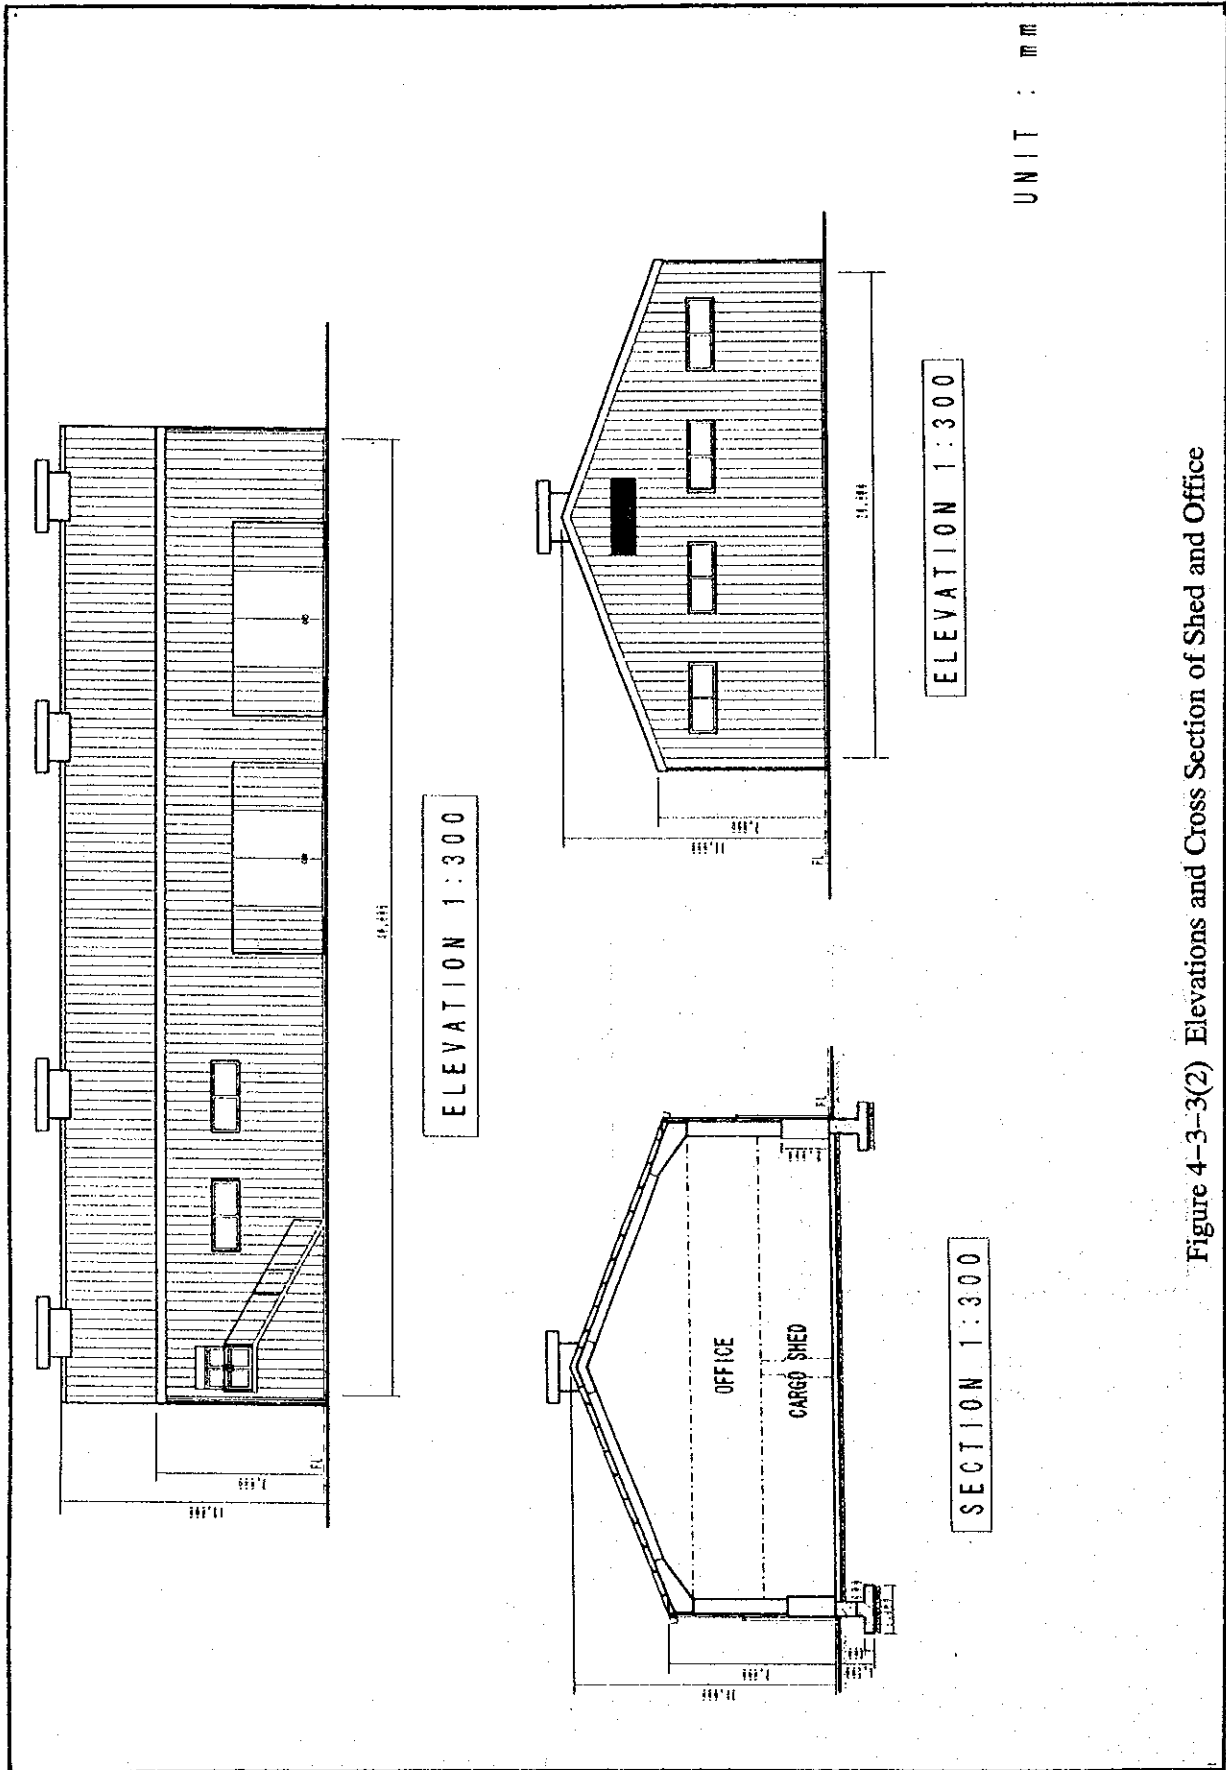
(2) Elevations and Cross Section of Shed and Office
